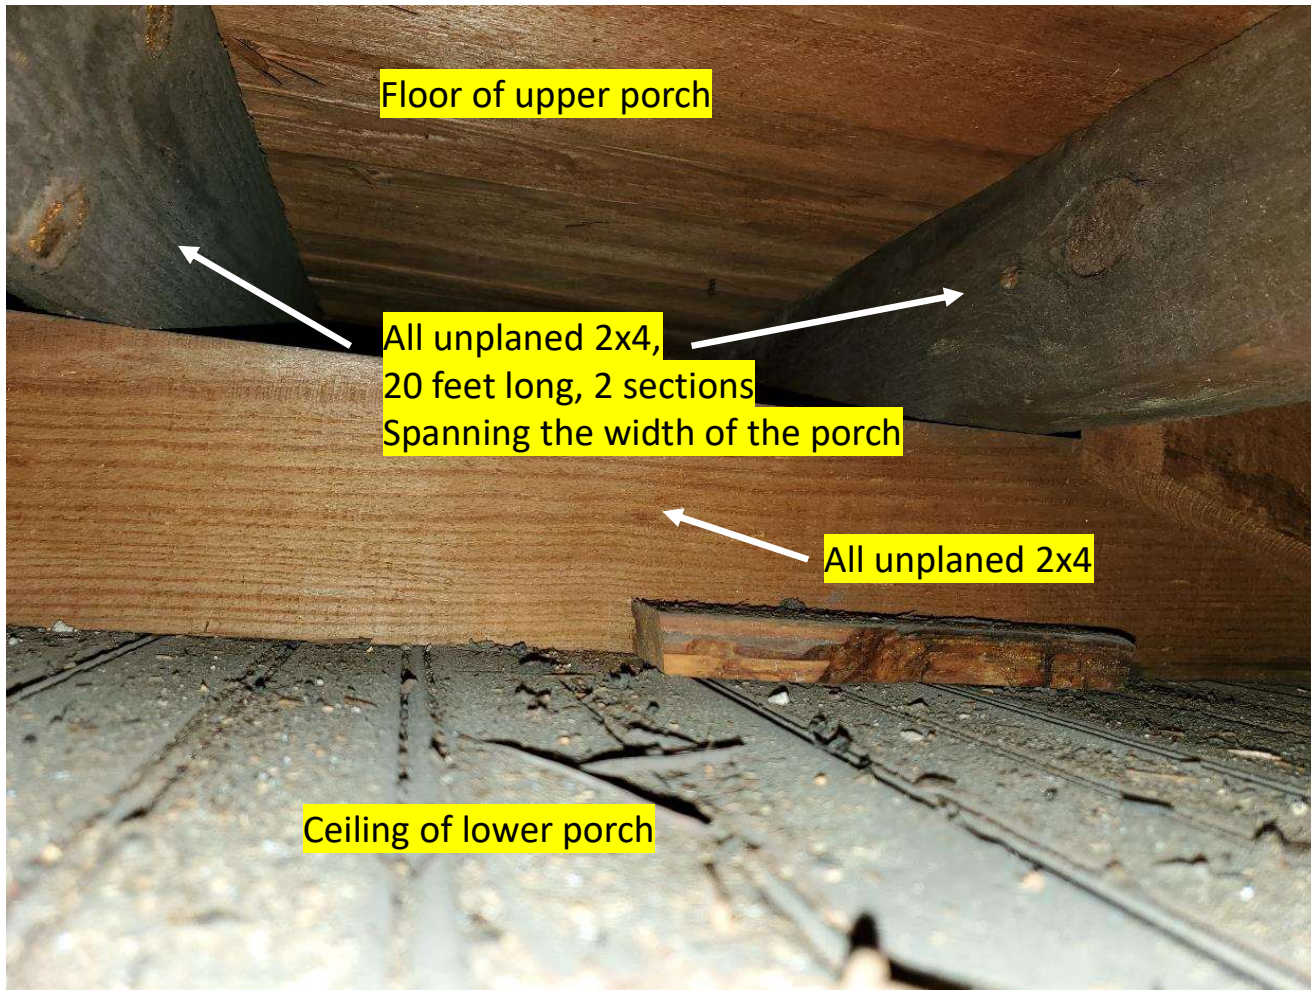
7102 Maple Ave – odd shaped shims holding up 20 Foot long 2x4s
